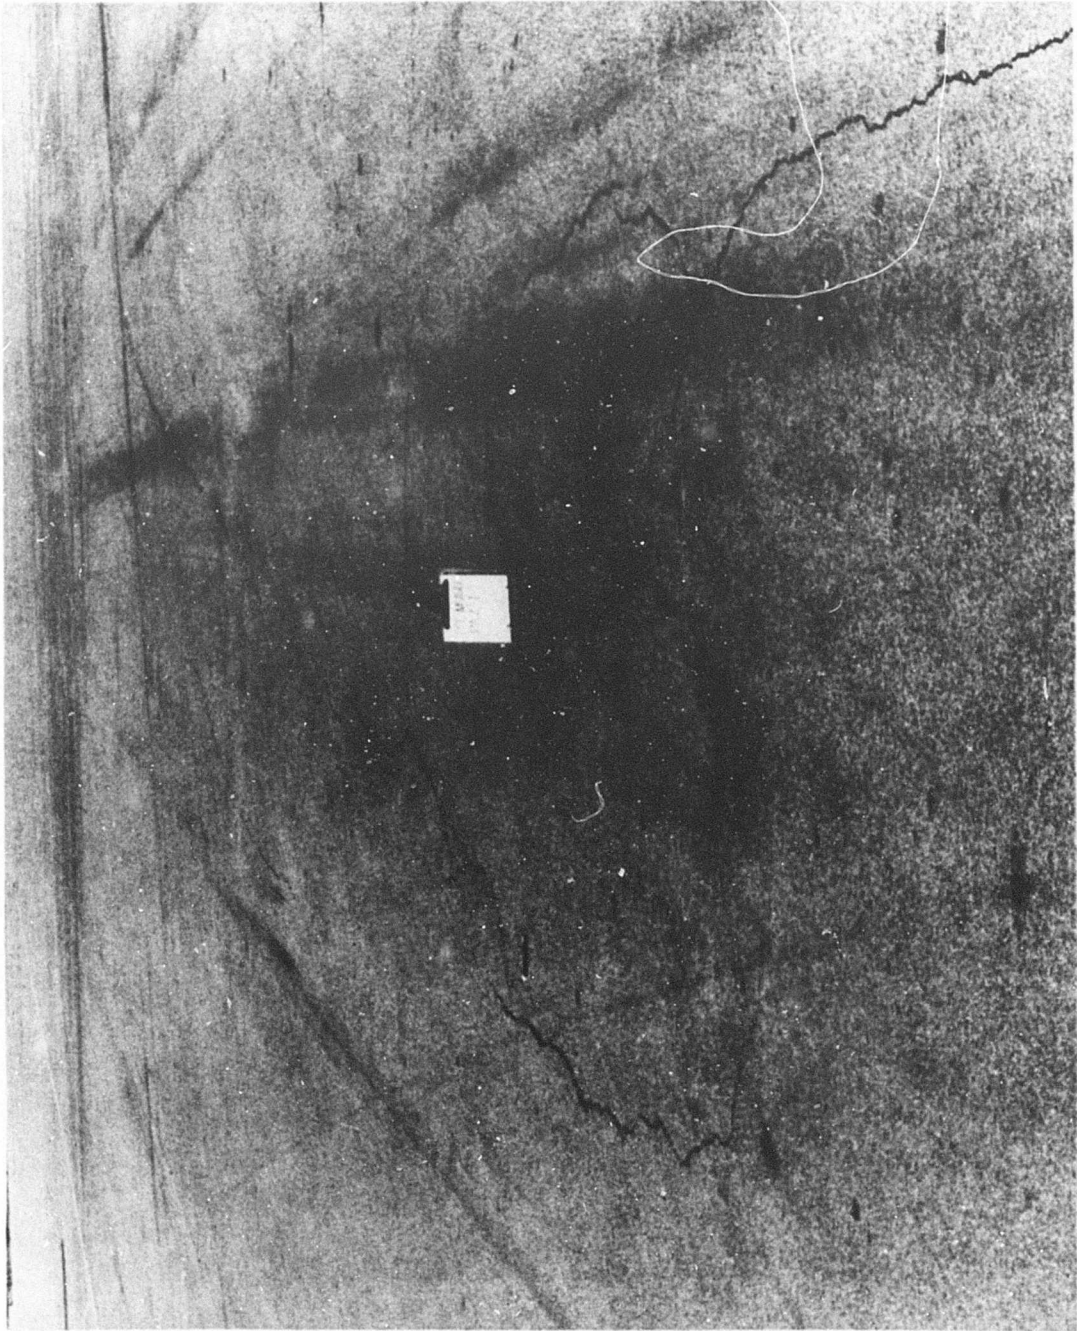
Longitudinal and transverse cracks, discrete area PA2-1.
